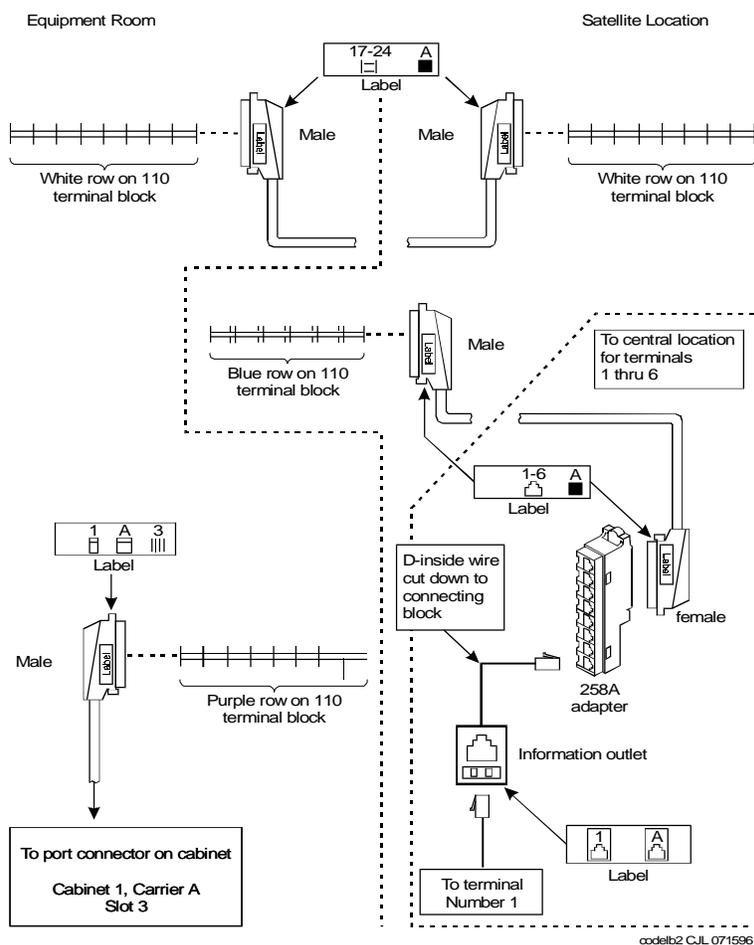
Example 3-Pair Labeling to Information Outlet
